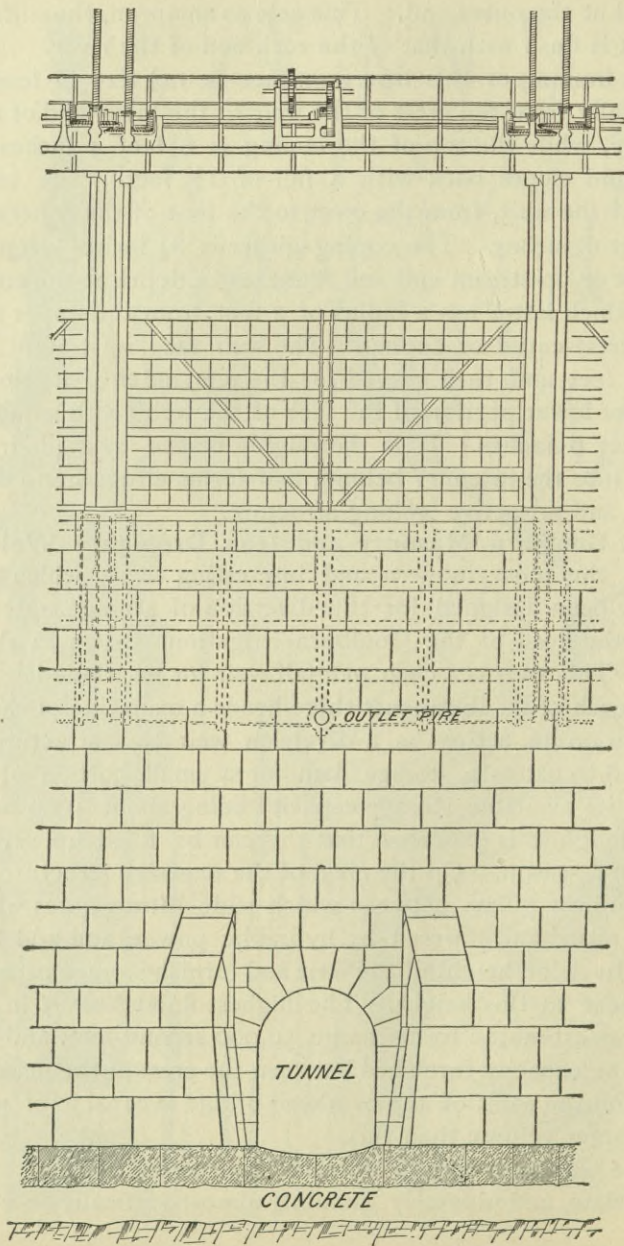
DOWN-STREAM ELEVATION, GOULBURN WEIR, AUSTRALIA.
